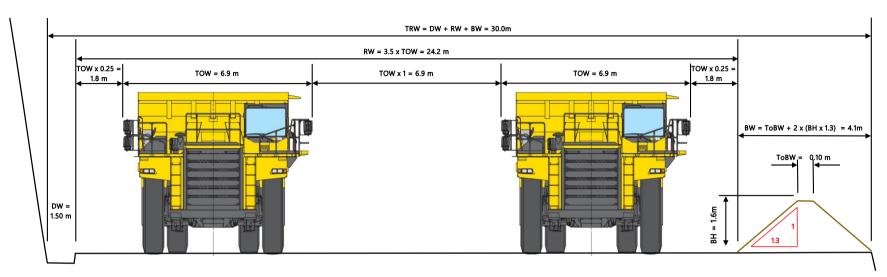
Dual-Lane In-Pit Ramp Layout
